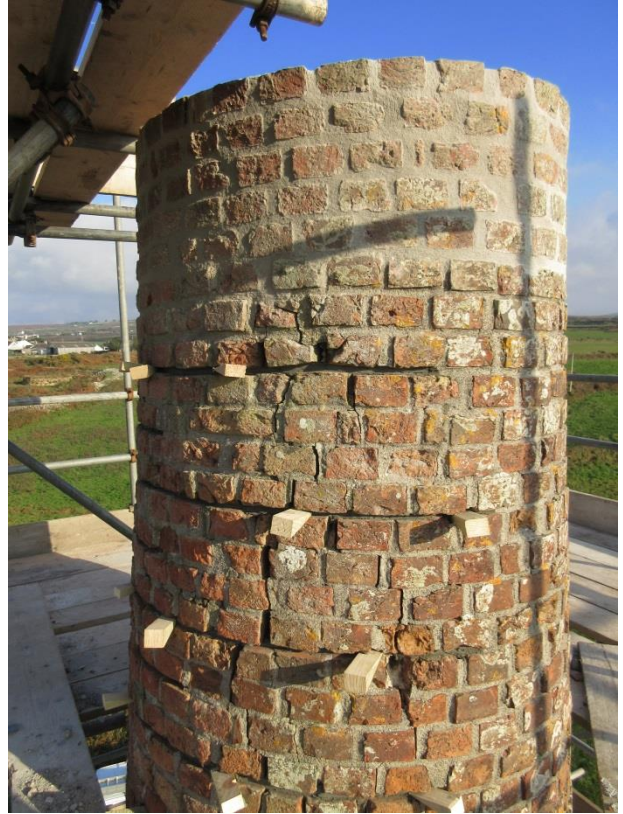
The helicoil reinforcement grouted into place. The wedges held the reinforcing in place until the grout had set.
